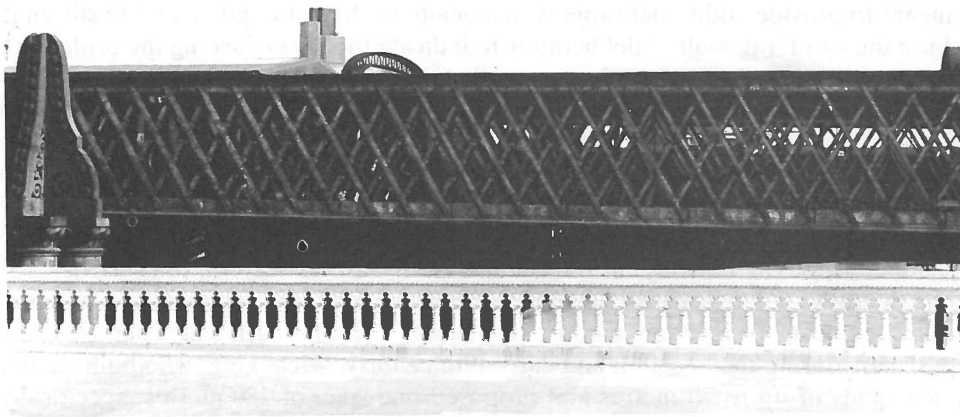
Lattice truss modelled as a beam during design. Blackfriars railway bridge, 1864.
